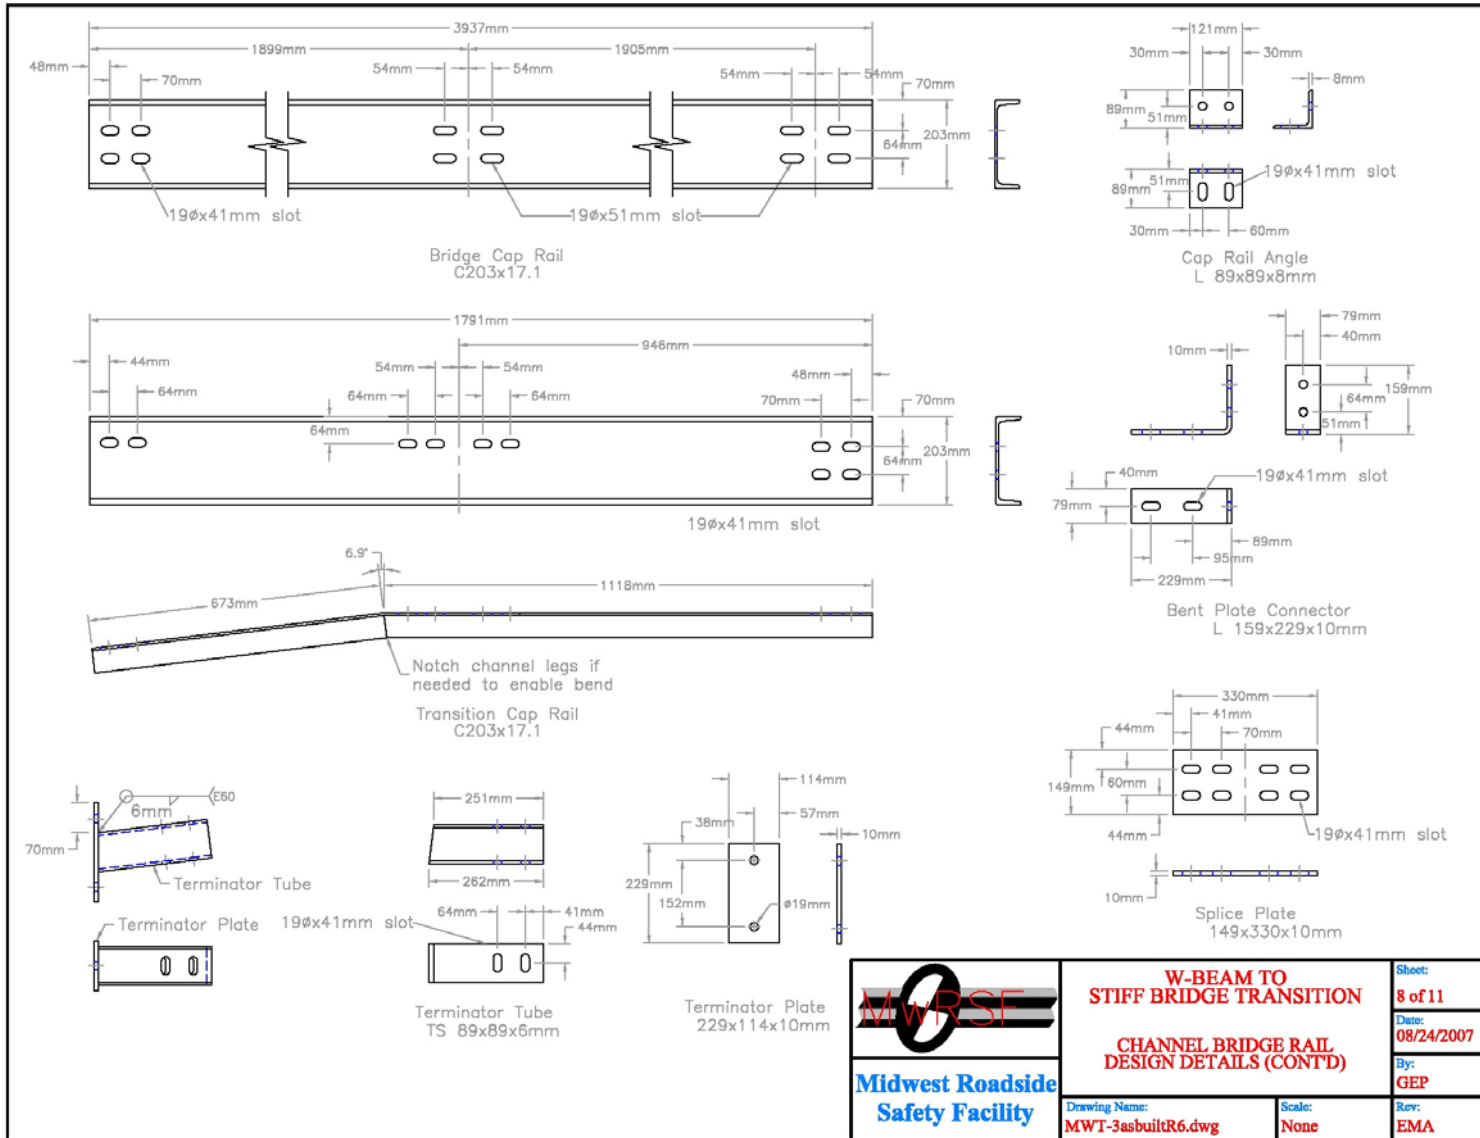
Channel Bridge Rail Design Details, (Design No. 1)
